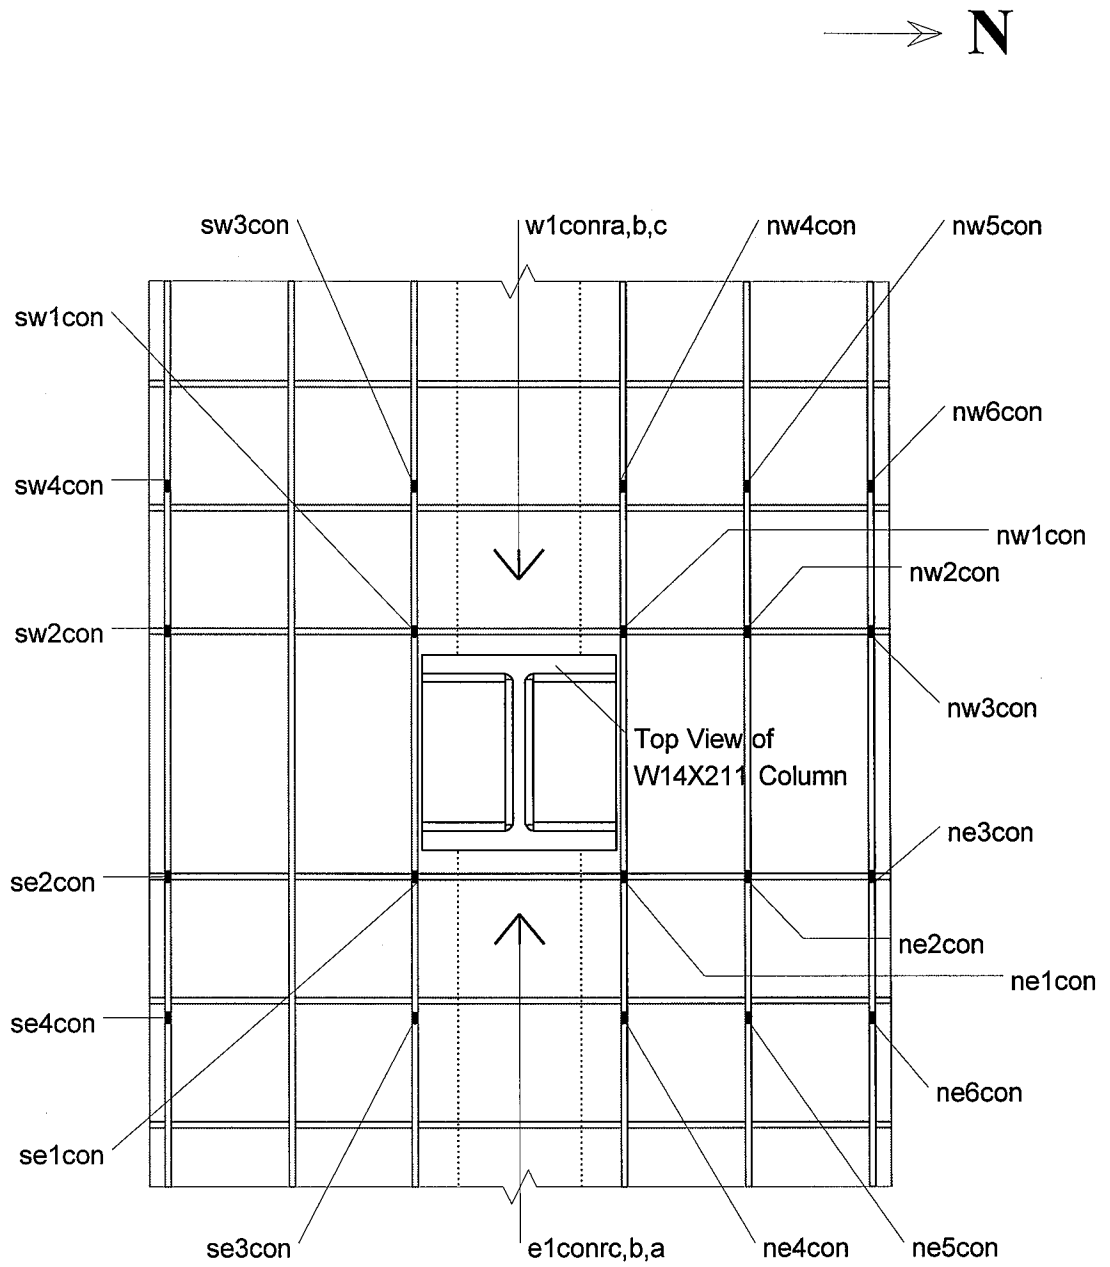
Strain Gages of Concrete Slab (Plan View of Specimens 2 and 3)
